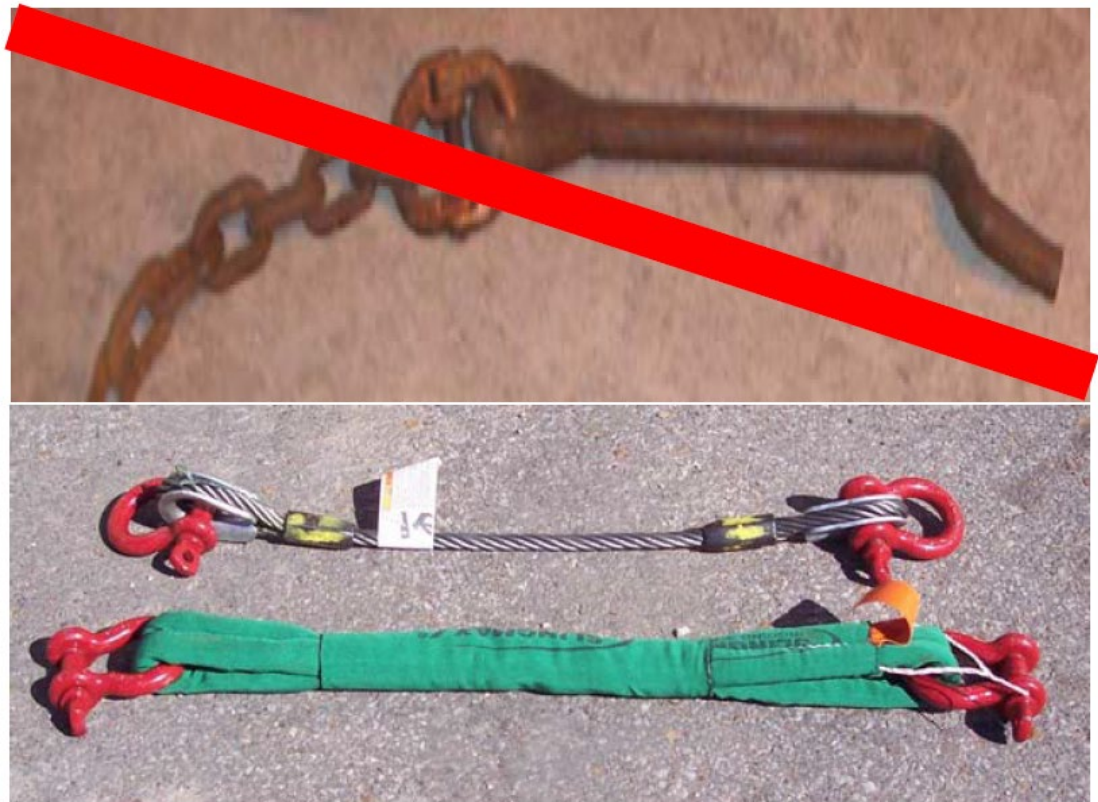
Figure SUB-PART D – 62 – Do Not Use Chains or Pigtails for Rail Unloading; Use Nylon Slings or Steel Cables
